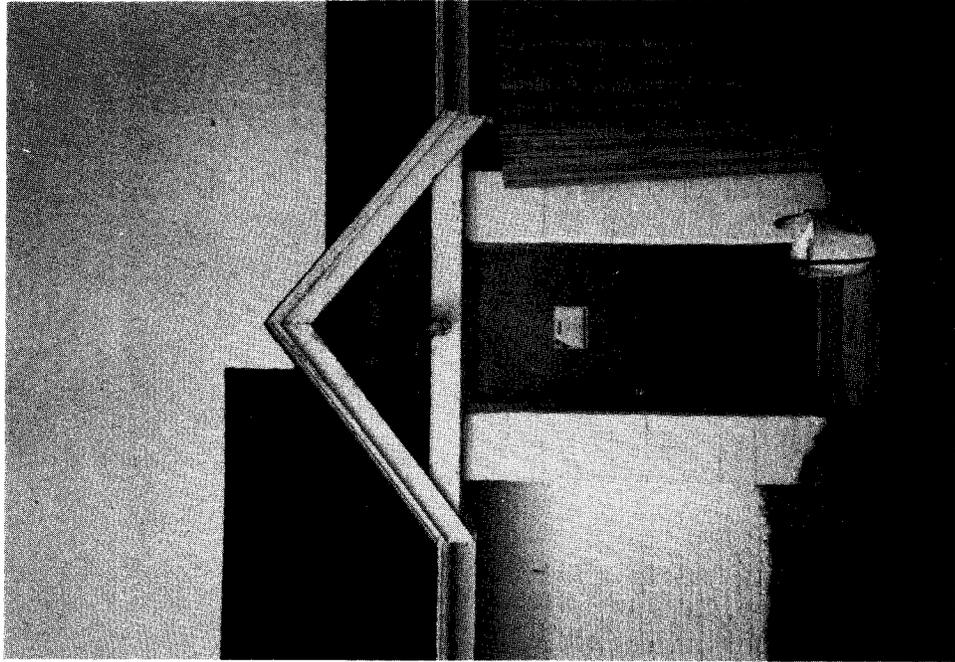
Concrete-block entry at junction of Connector at Keeper's Dwelling and Tower Connector, east elevation.
